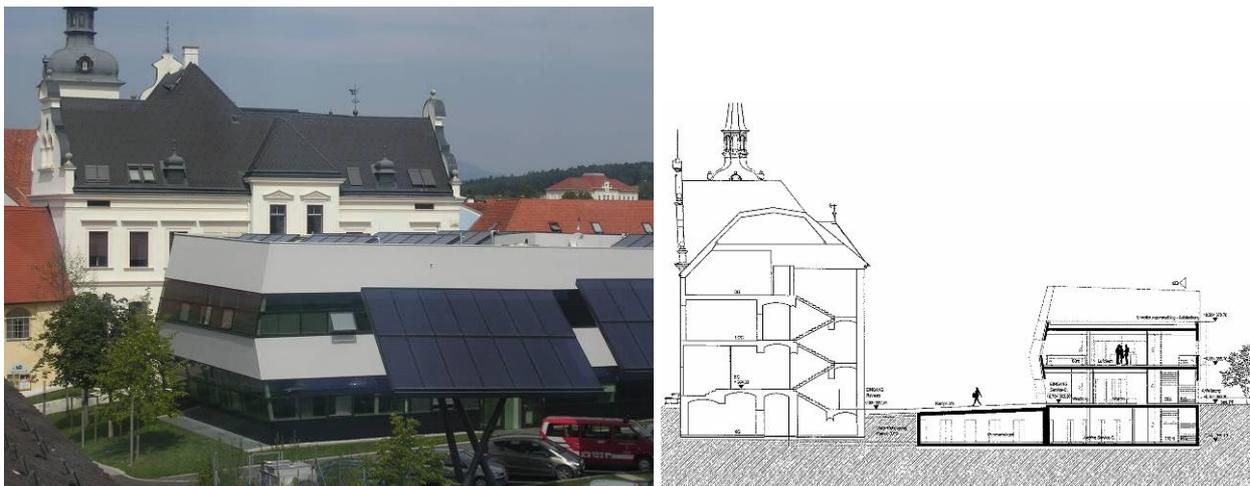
Photo and section drawing of the old renovated Town Hall and the new built Service Centre
